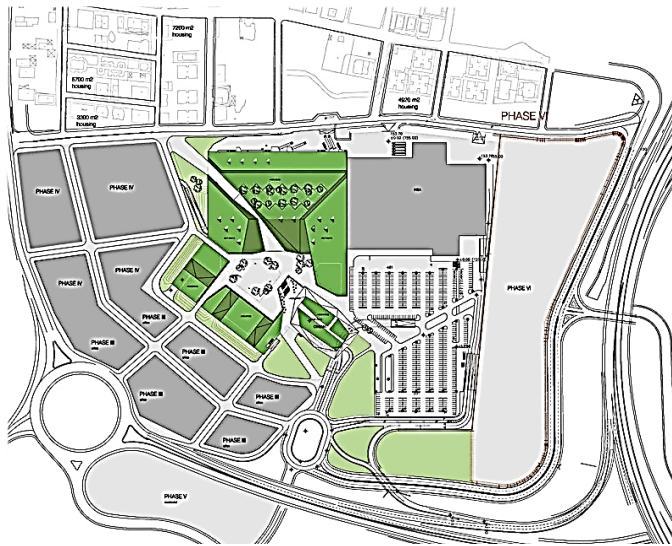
The Site Plan of Meydan Retail Complex and the Surrounding Area
